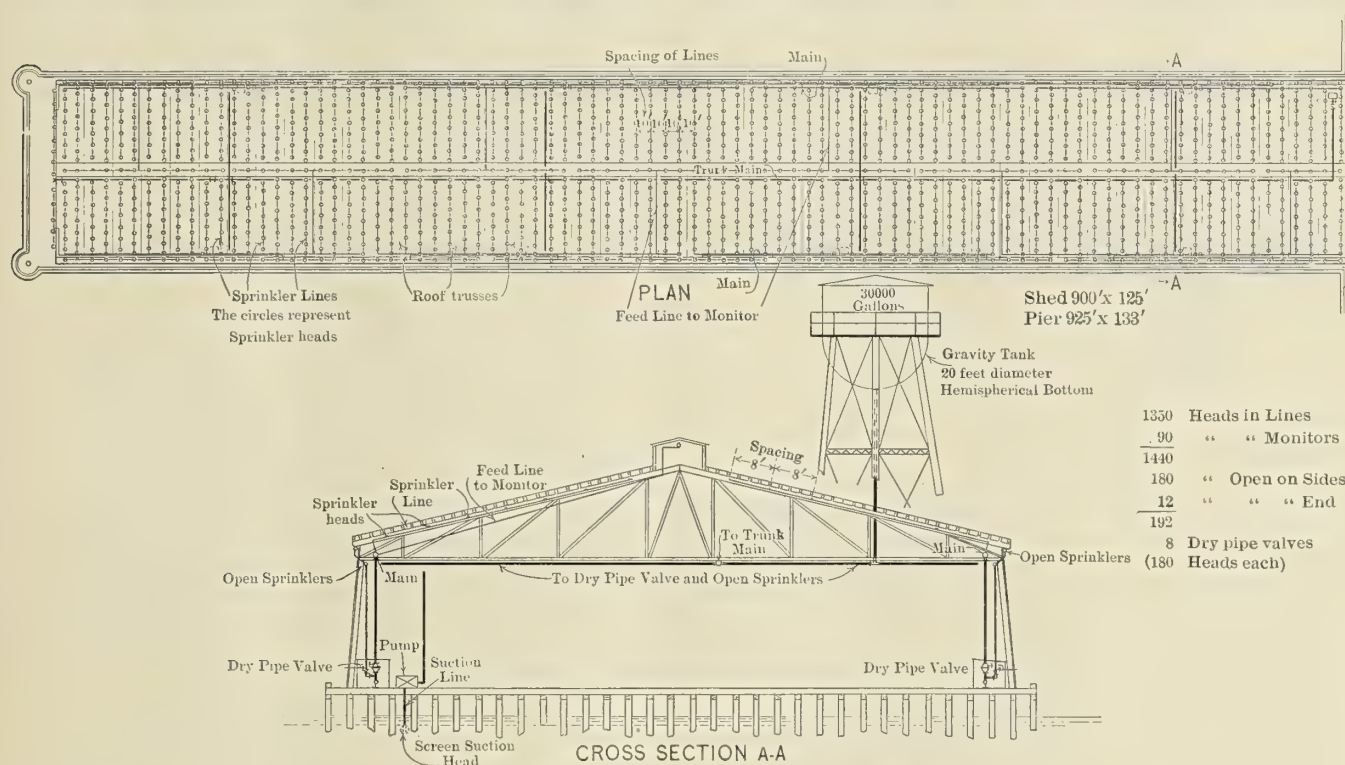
LAYOUT OF SPRINKLER EQUIPMENT FOR A PIER SHED
